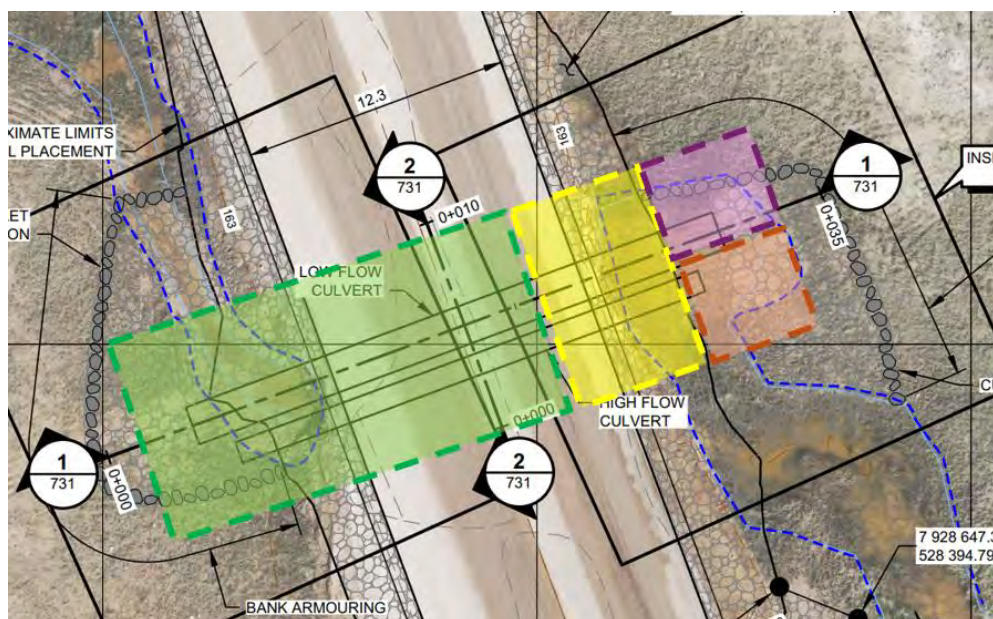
Approximate Foundation Acceptance Area, Plan View. Section 1 highlighted in green, Section 2 highlighted in yellow, Section 3 highlighted in purple, Section 4 highlighted in orange.
